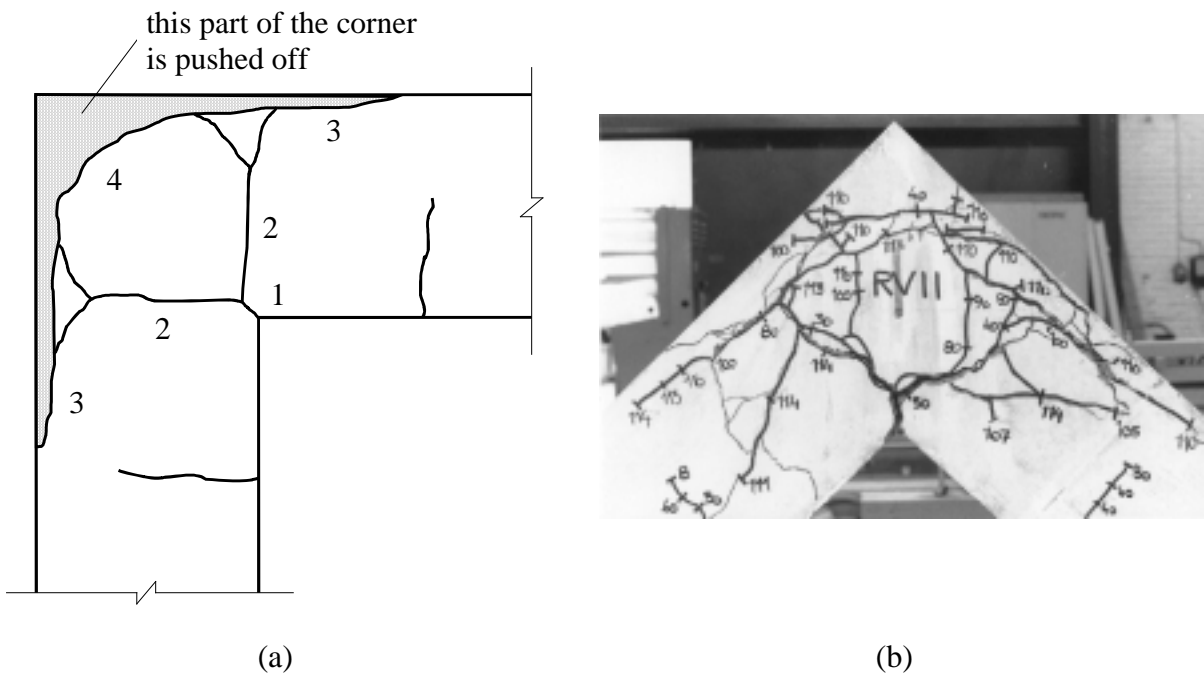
Crack pattern in frame corner when using detailing *Type 3* or *Type 4*. The numbers in (a) show the order of appearance of the crack propagation; (b) shows the crack pattern after failure for a frame corner using detailing *Type 3*. Photo from Johansson and Karlsson (1997).
